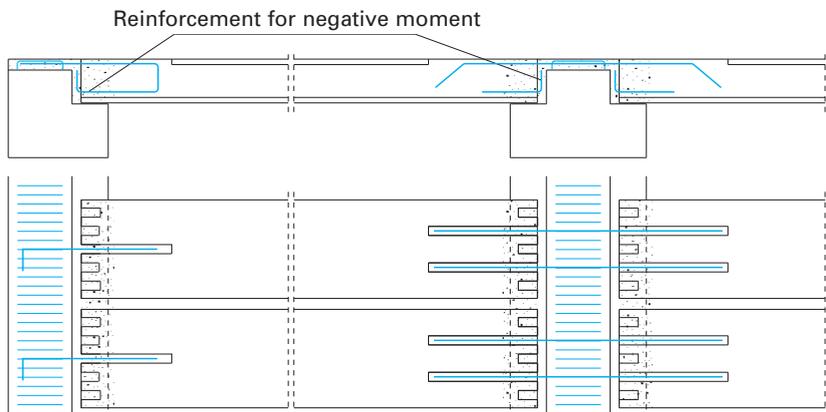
Hollow core floor in continuity on an inverted T beam.
